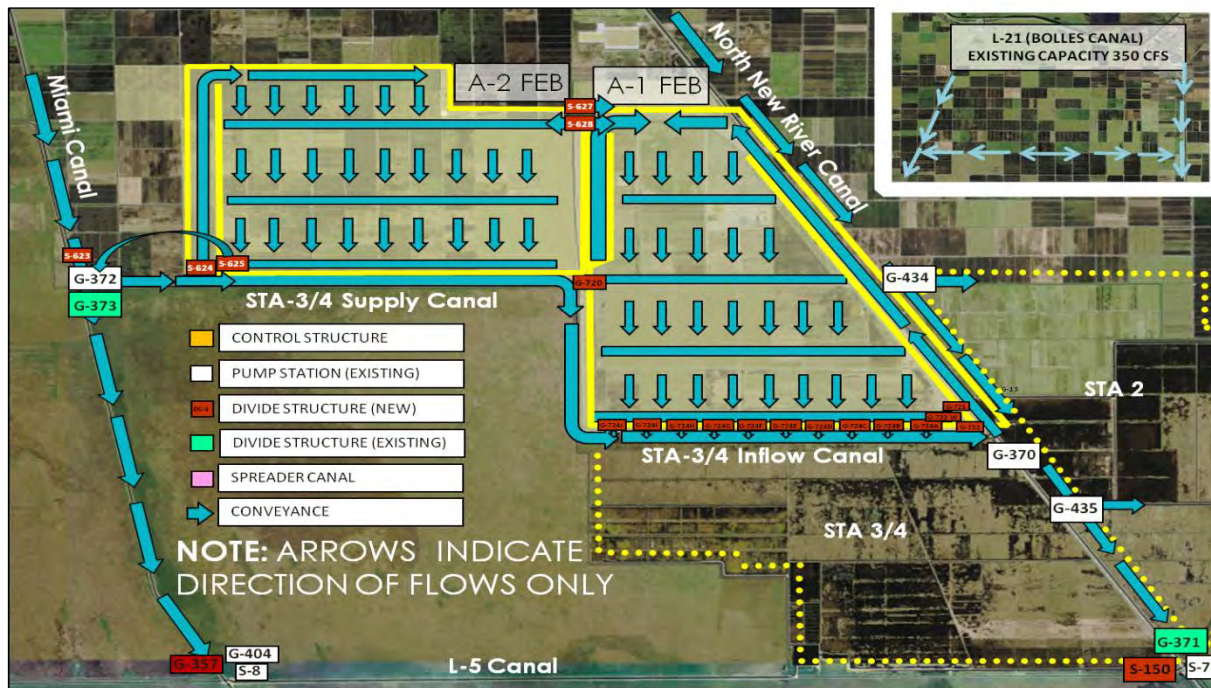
FINAL A-2 FEB LAYOUT WITH EXISTING A-1 FEB
